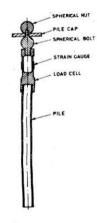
Sketch Showing Fixing Arrangement of Pile and Pile Cap
